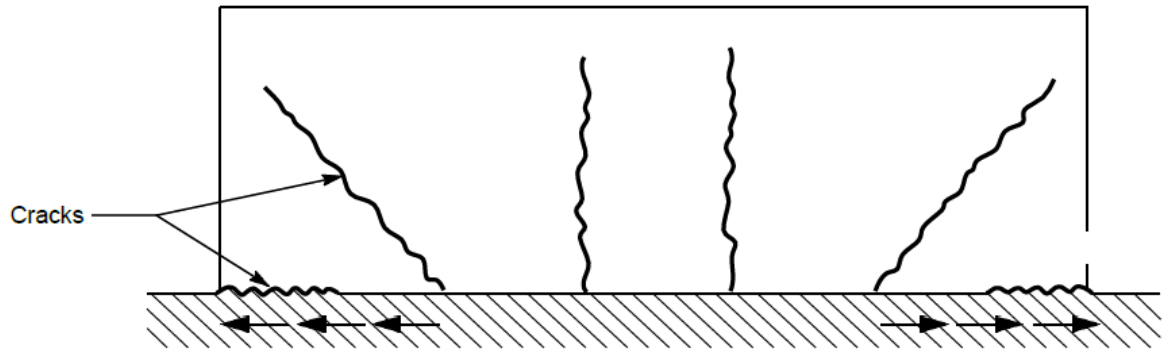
Crack Pattern of Concrete Member Subjected to Edge Restraint (Highways England, 1987)
